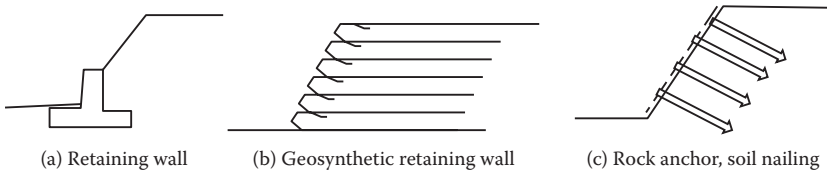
Slope stability techniques by retaining wall construction.
